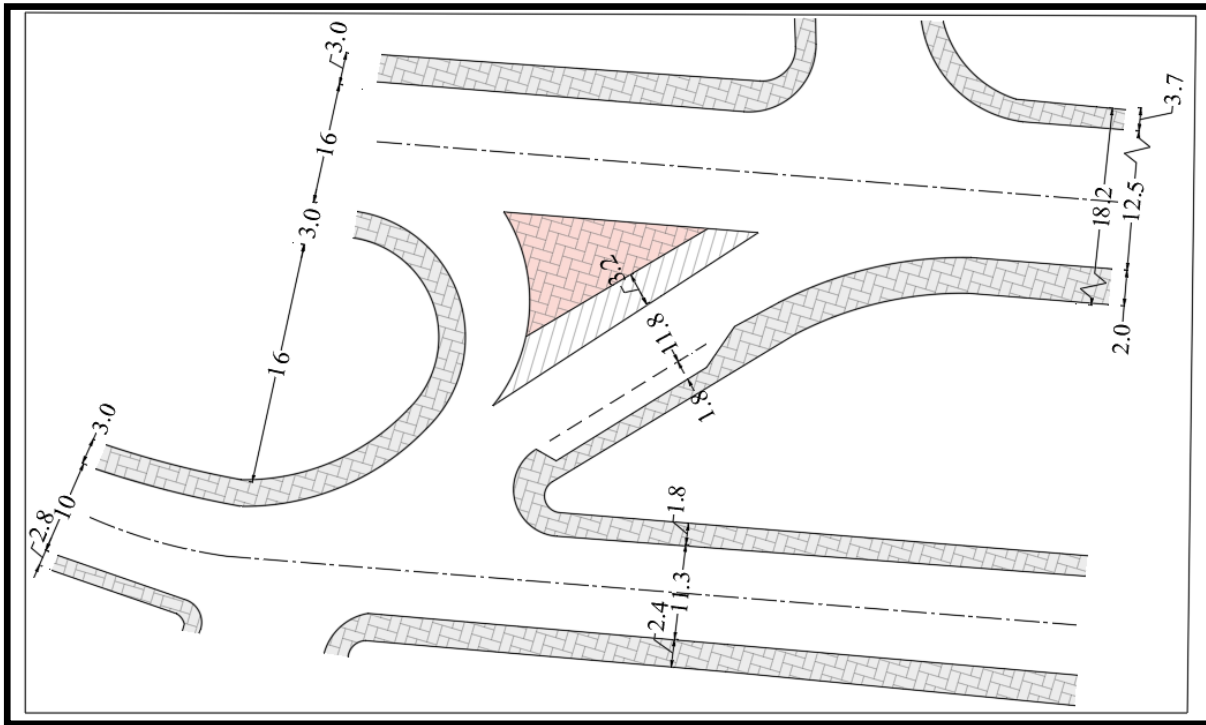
A Plan Of Section No.5 Existing Cross Section
